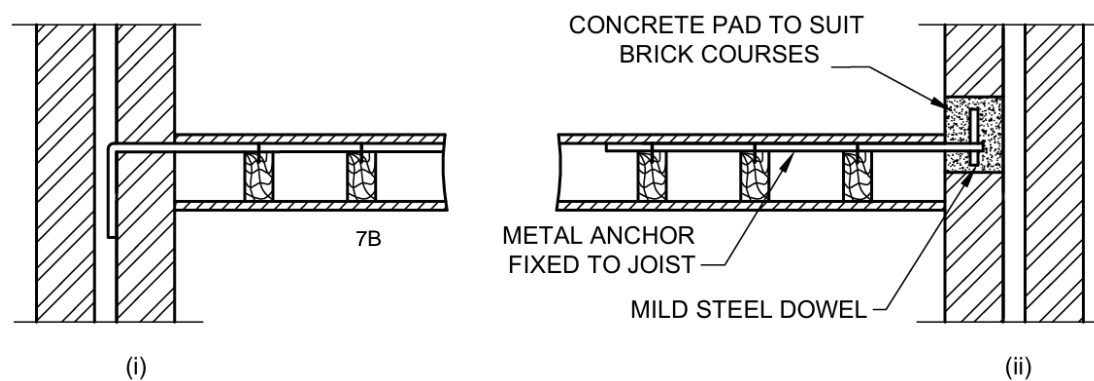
TYPICAL DETAILS FOR ANCHORAGE OF SOLID WALLS
